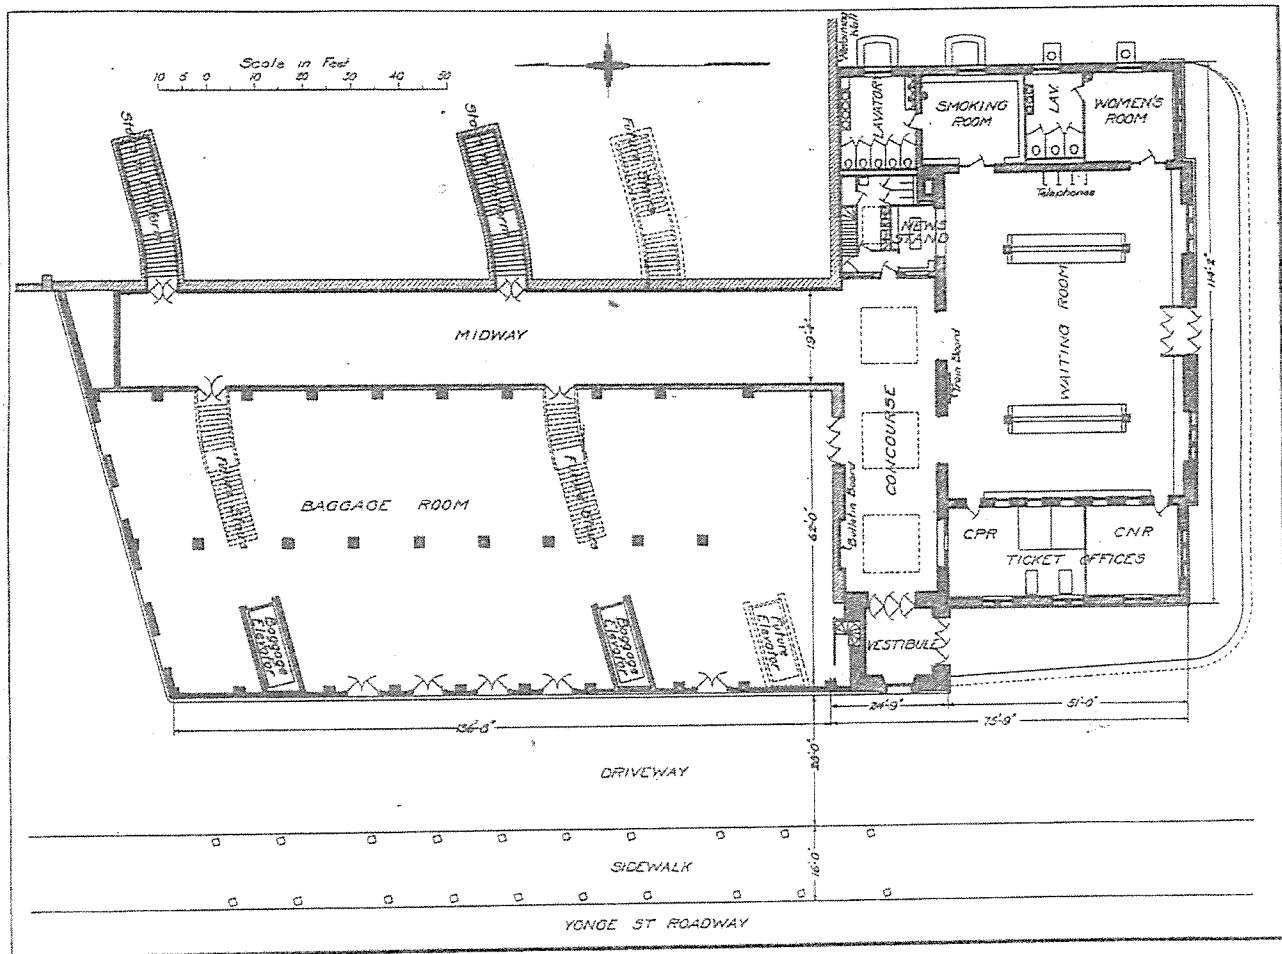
Ground Plan, North Toronto Station, Canadian Pacific Railway.
